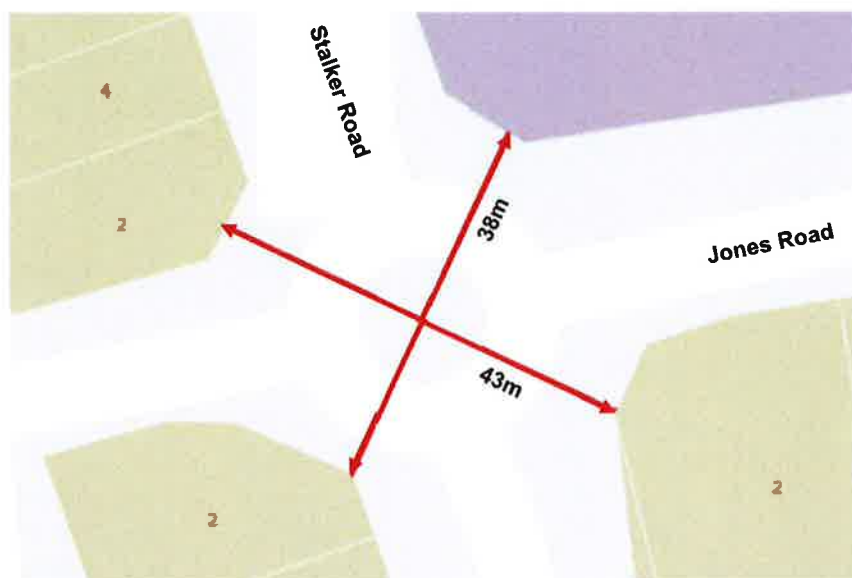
Key Dimensions at the Stalker Road / Jones Avenue Roundabout, Shotover Country
